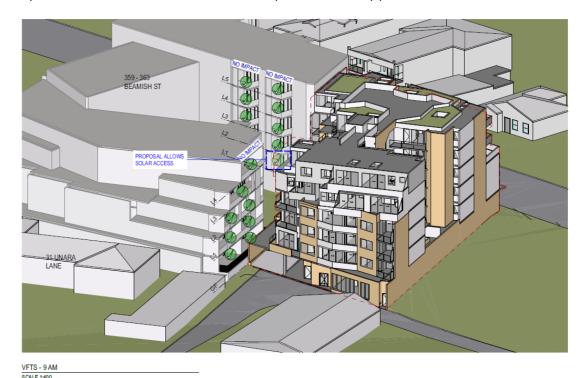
Extract of Views from the Sun Analysis: Additional First Floor Unit Achieving Solar Access
